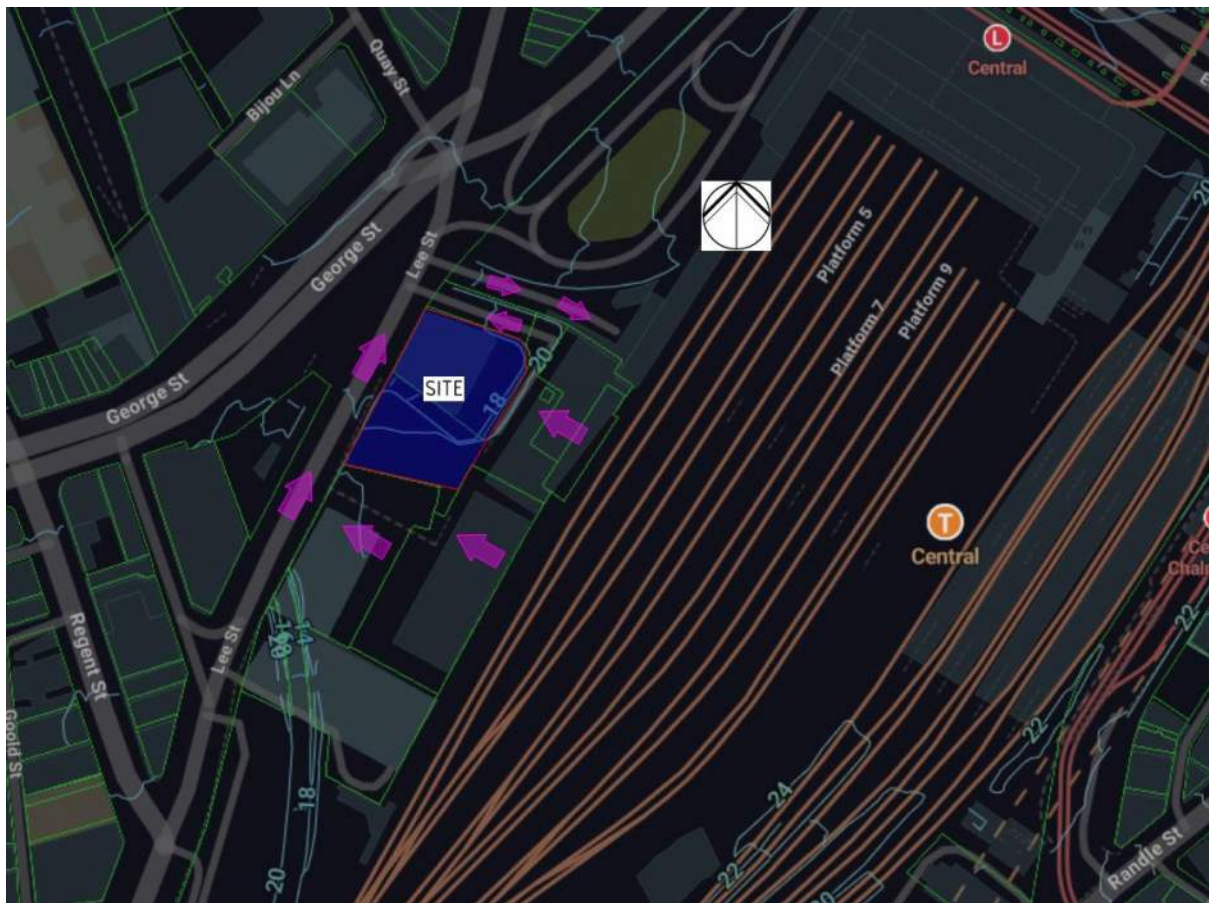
Existing Surrounding Elevation (Mecone, 2022)
